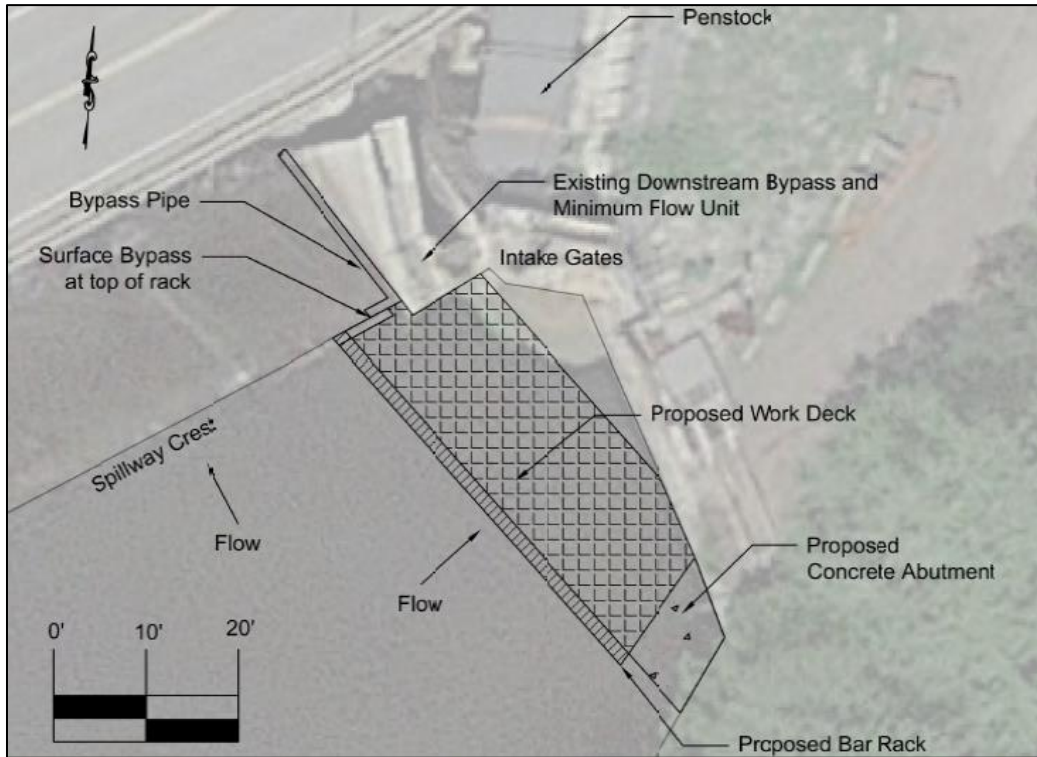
Angled bar rack designed for the Pepperell penstock intake (plan view).
